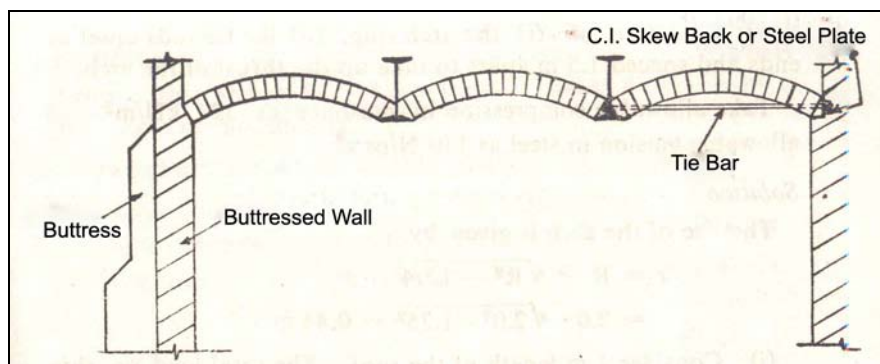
Jack arch floor (Source: *Masonry and Timber Structures including Earthquake Resistance Design by Arya*)
